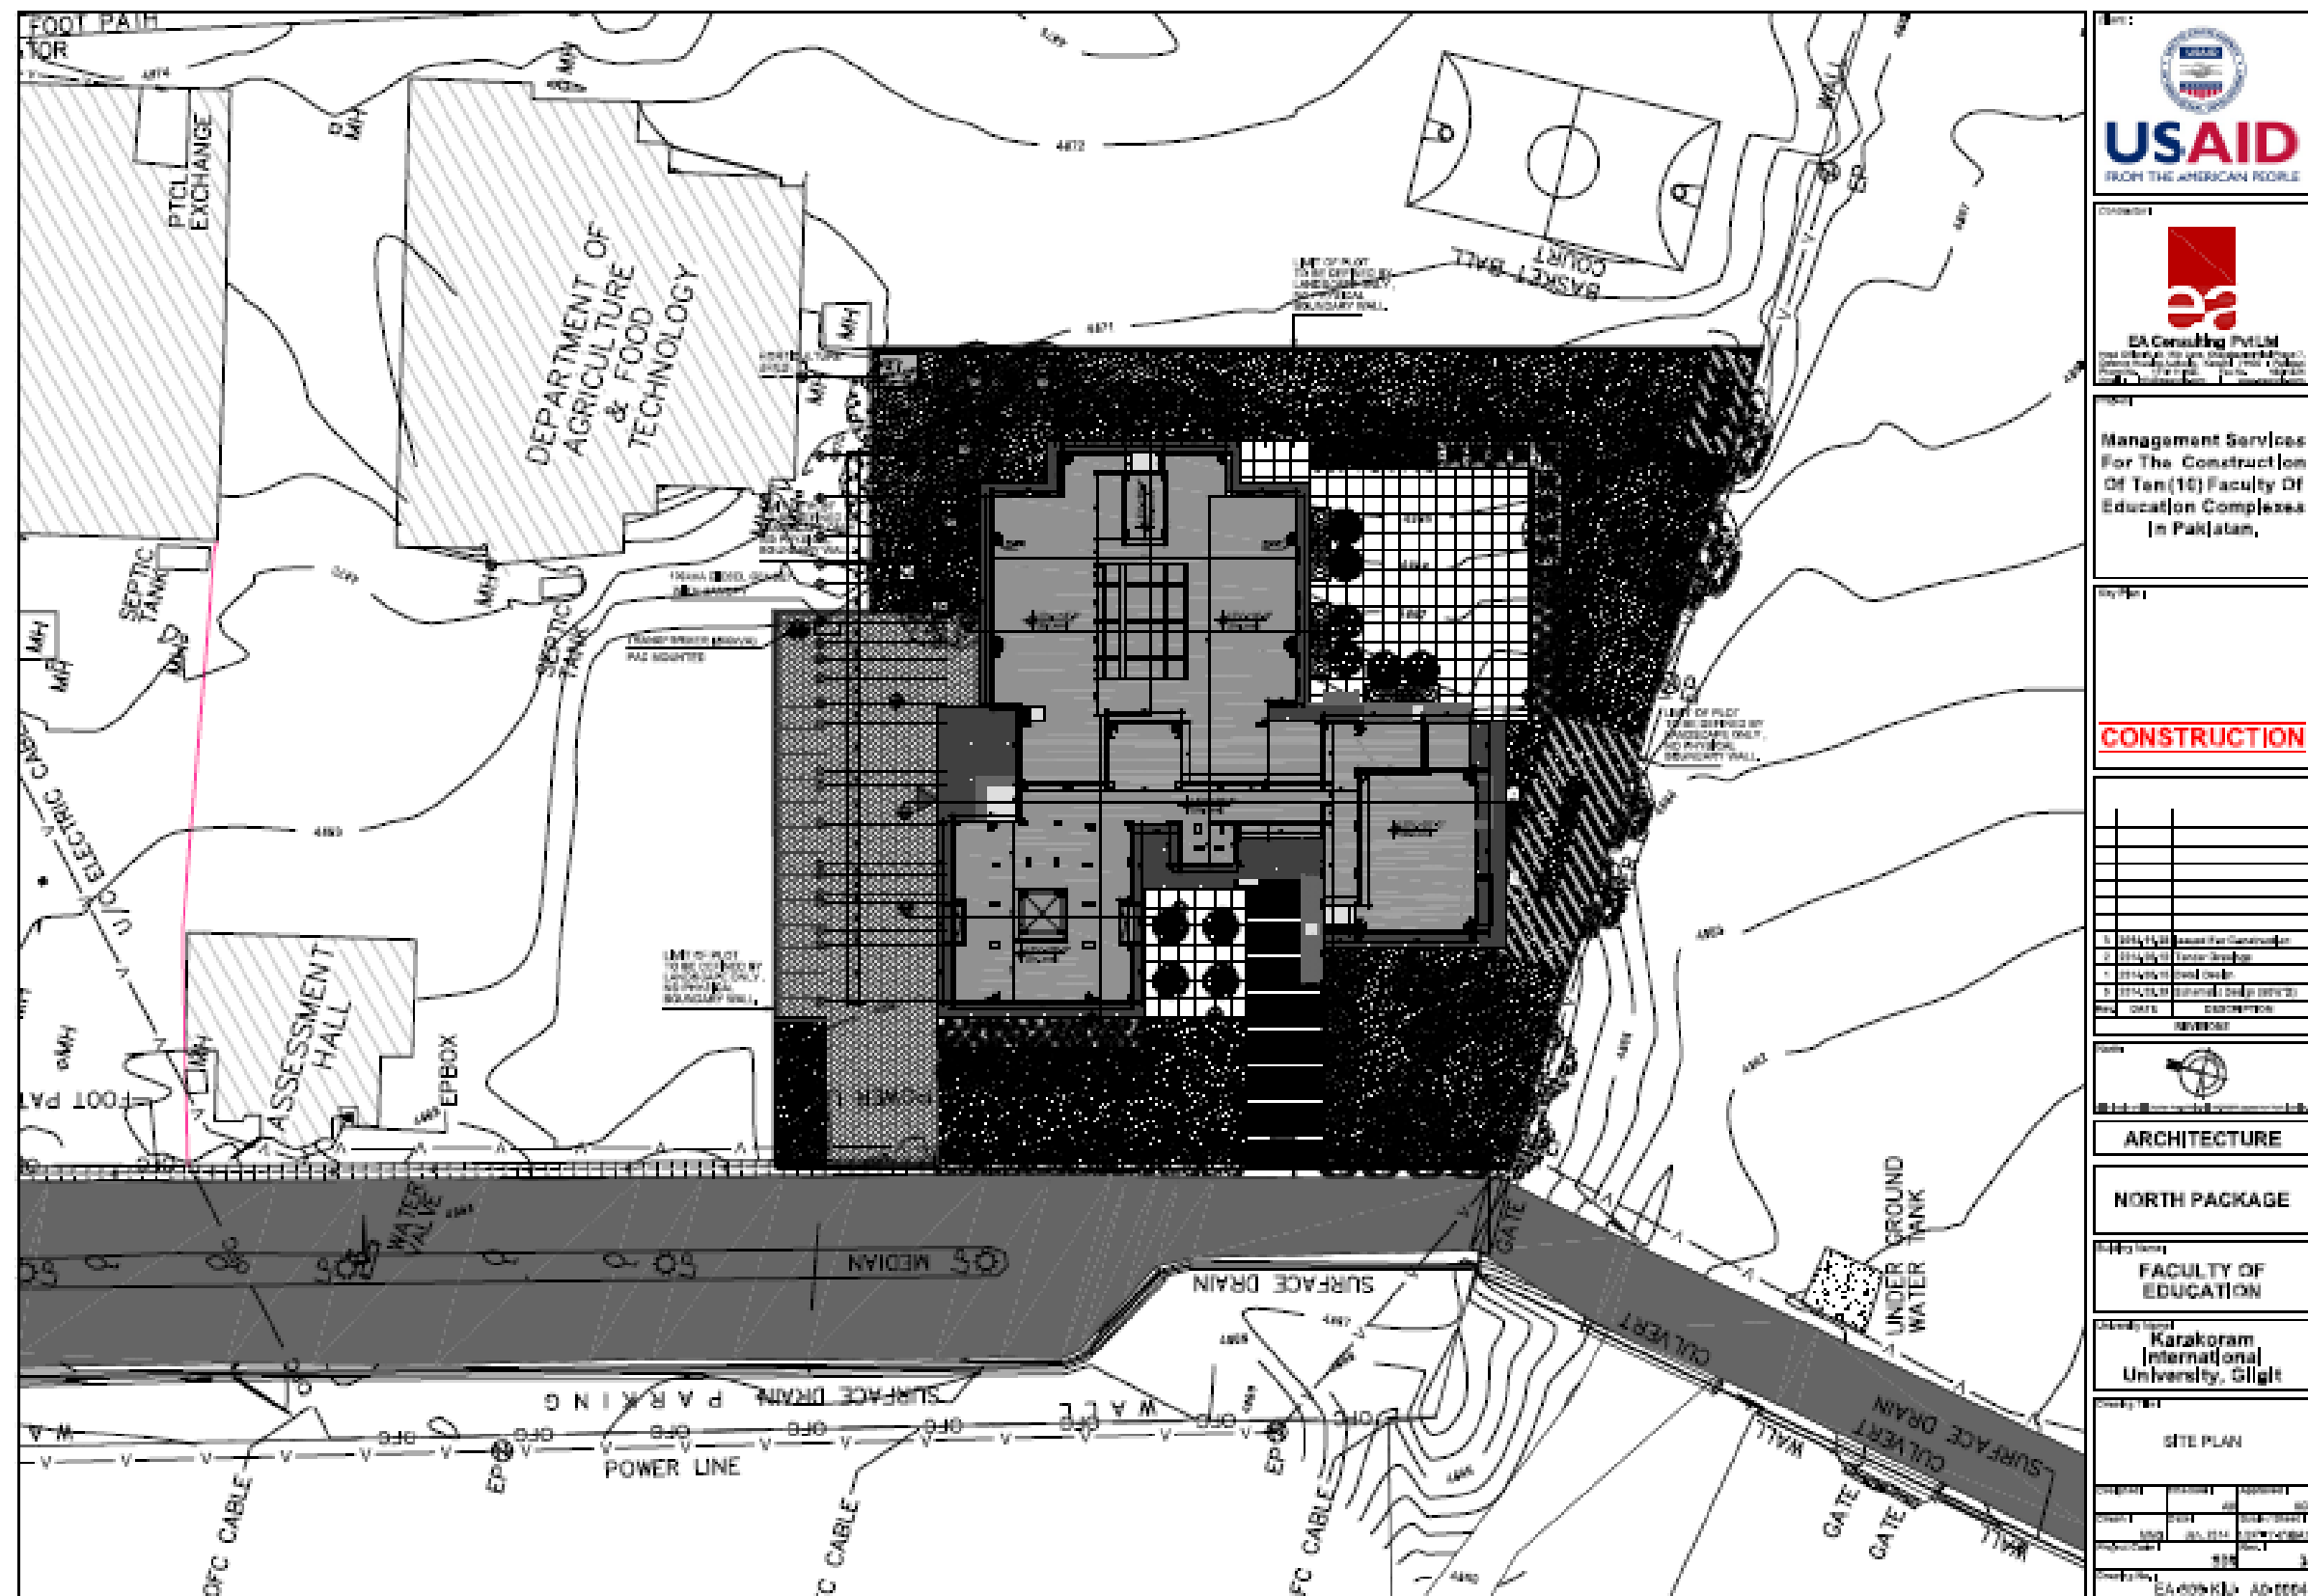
Layout Plan of proposed Educational Complex in KIU
